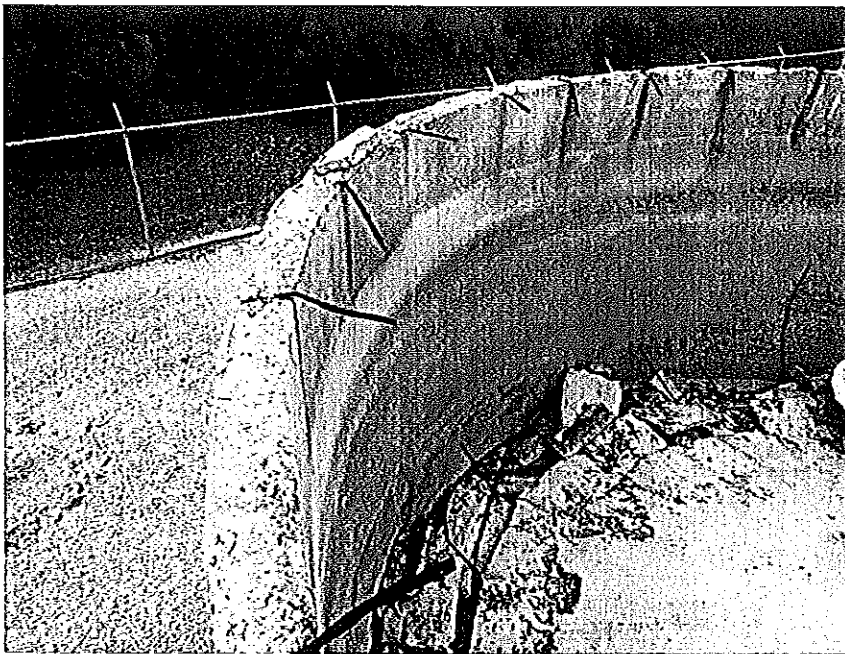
Overview of Tank 1. Note the rusted reinforcement and collapsed top cap.
